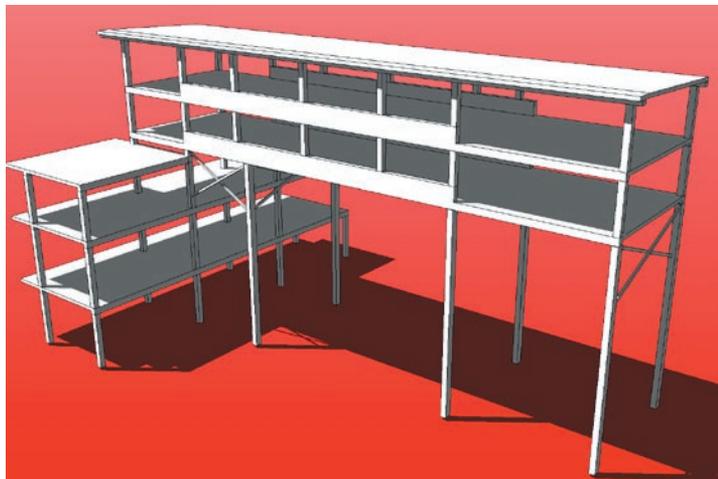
Elevated Block Structure. Columns on the right are afforded lateral support through Auditorium under
